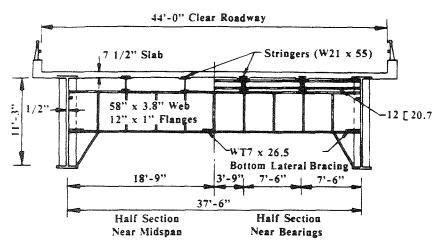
Cross section of 180-ft simple span, noncomposite three-lane, two-girder bridge (Ref. 55).
